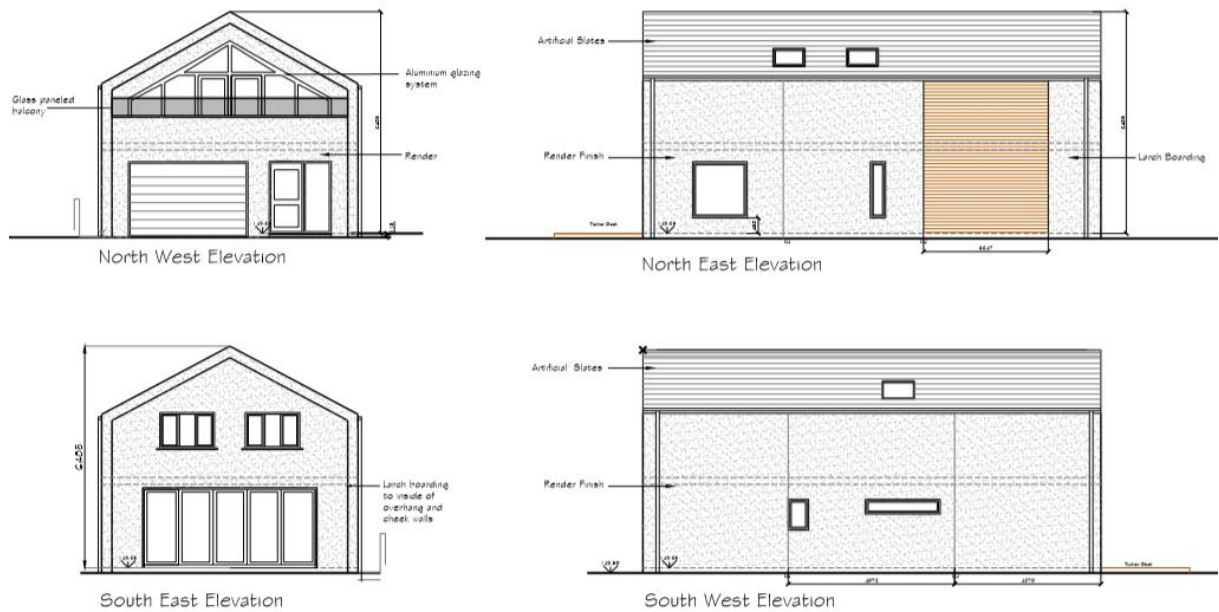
B – Previously approved height/elevations plan under APP/2018/0126
